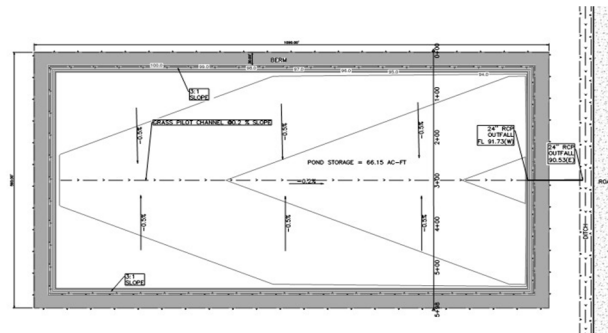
Detention Pond with Single Pilot Channel - Plan View
